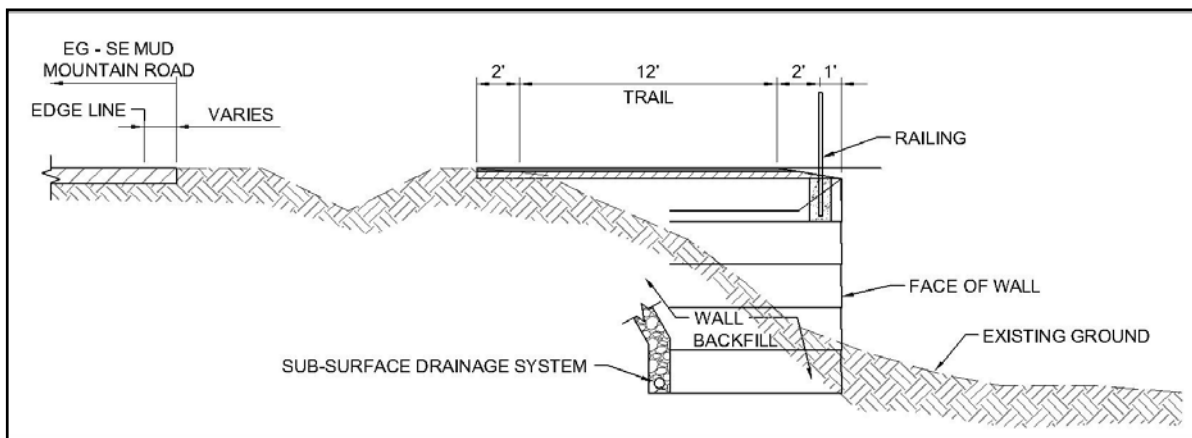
Section A - Trail South of SE Mud Mountain Road
